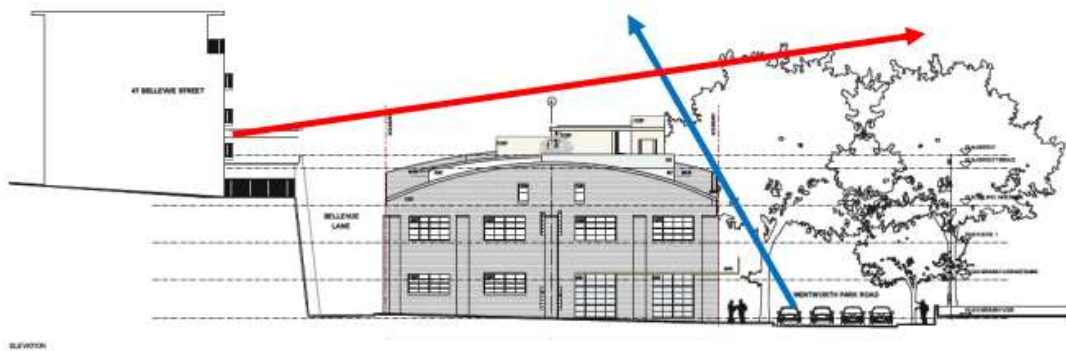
shows the proposed rooftop addition which is misdescribed in the application as a rooftop conversion
